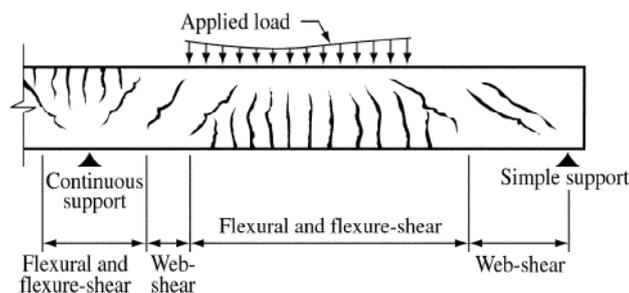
Types of cracking in concrete beams
